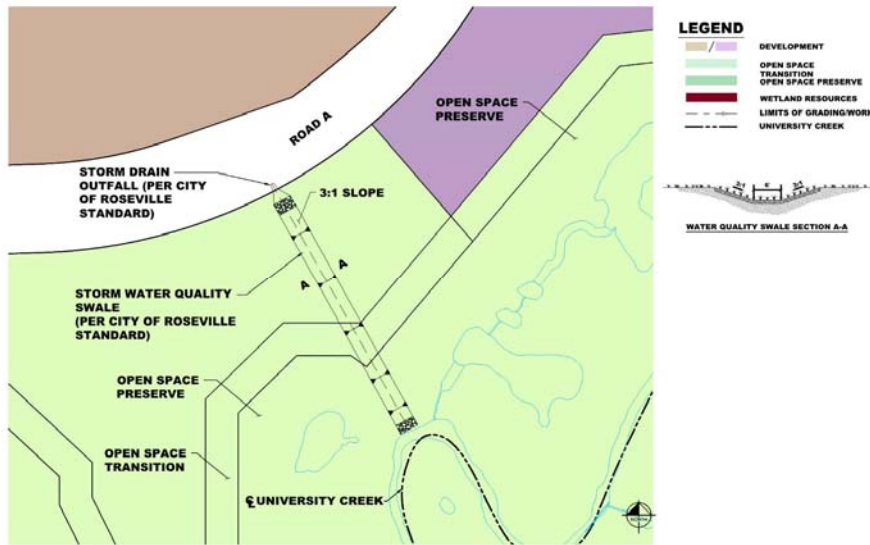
Typical Open Space Transition at Storm Drain Outfall [UPDATED \(09/01/2019\)](#)
